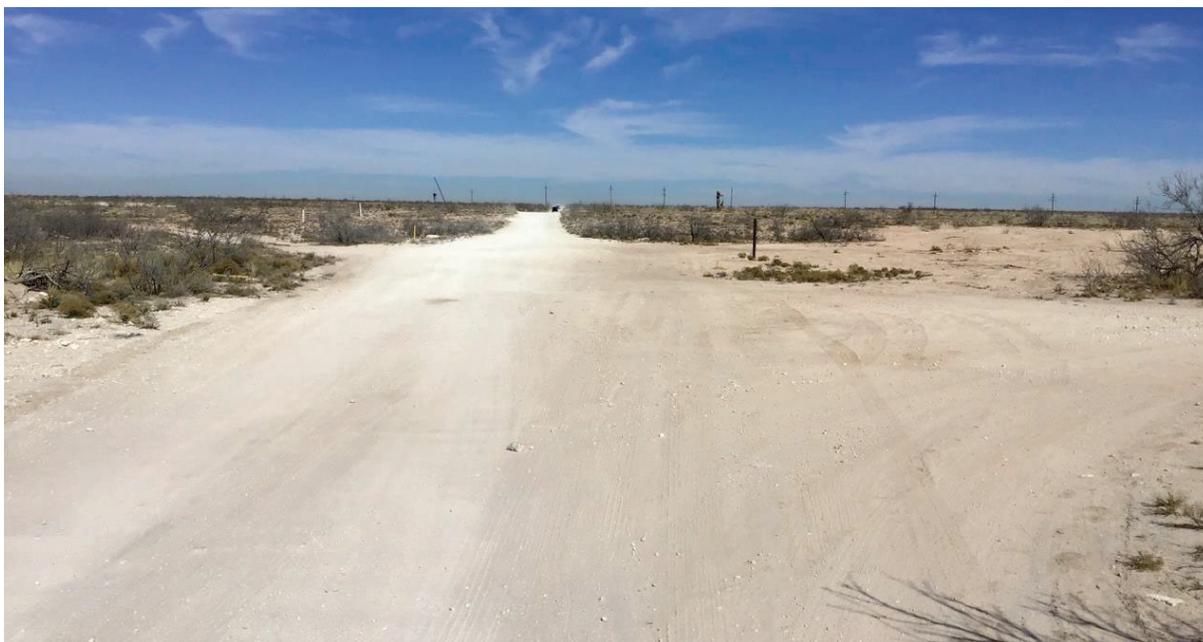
Looking north along the lease road at Photo Location 15. No culvert or low water crossing present across lease road.
